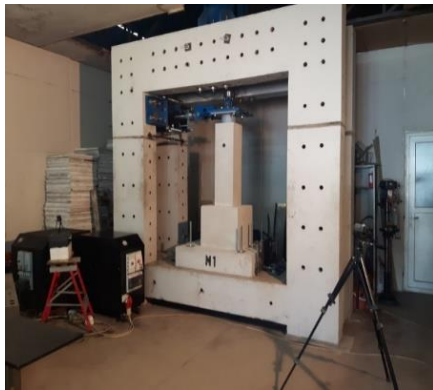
Set-up of 1/2 scaled model M1 in laboratory testing frame
